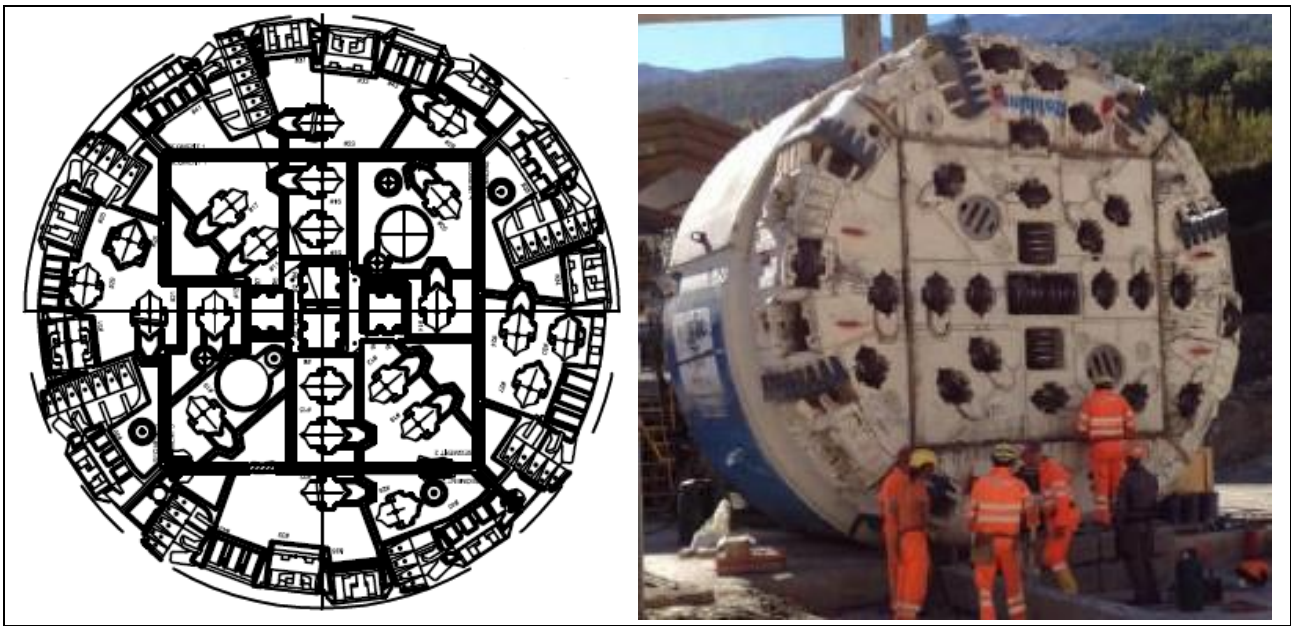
TBM Chutterhead. On the left cutterhead section (Robbins Company, 2005), on the right a photo of cutterhead taken during its assembly.
